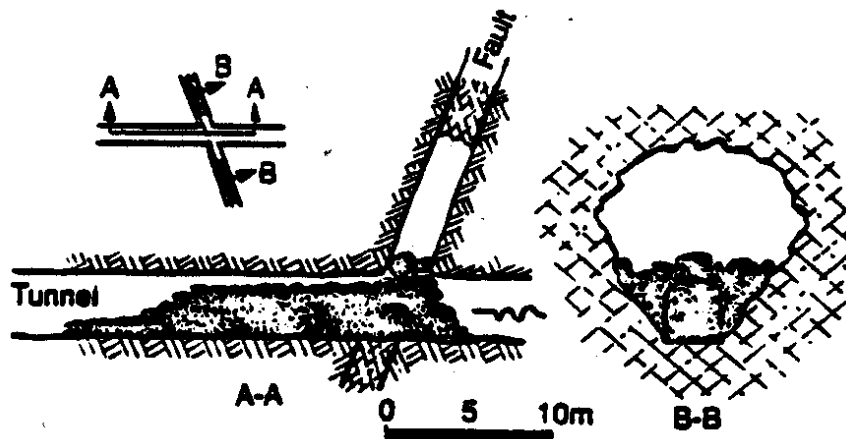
Sketch of the collapse blocking the 12m<sup>2</sup> headrace tunnel at Hemsil Power Plant(1960). It was caused by a 2.5m-thick, brecciated zone with thin veins containing swelling material.
